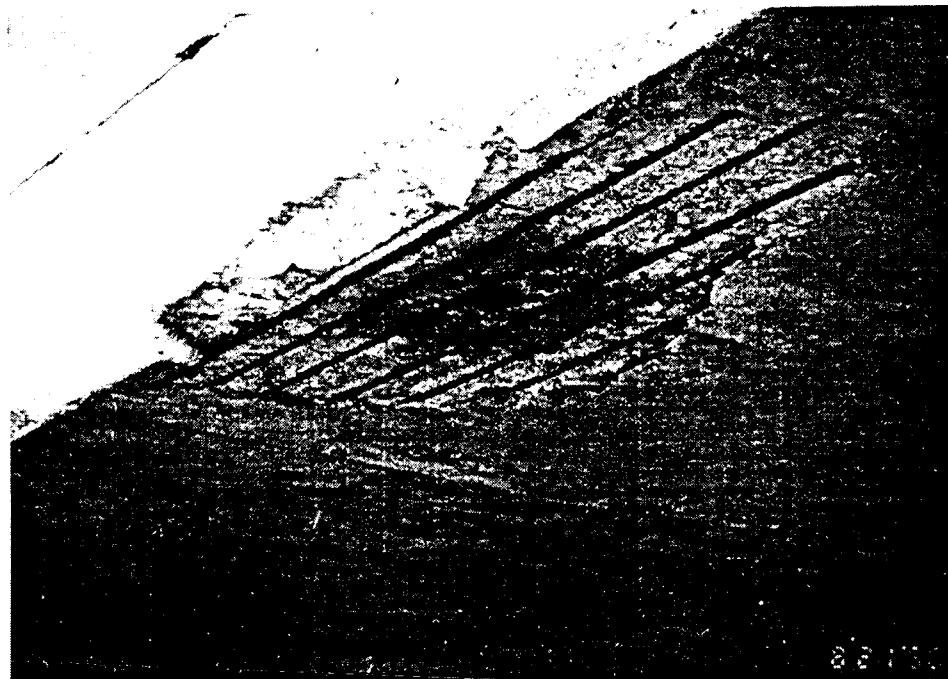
Bridge III: Photograph of exposed reinforcement in slab.
